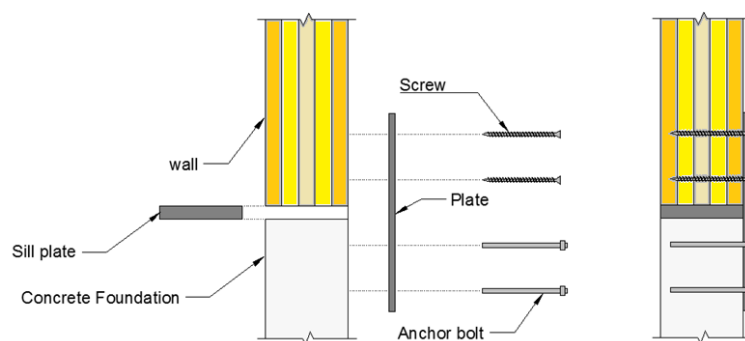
Straight plate connection for wall-to-concrete/masonry foundation or wall-to-concrete/masonry wall.
